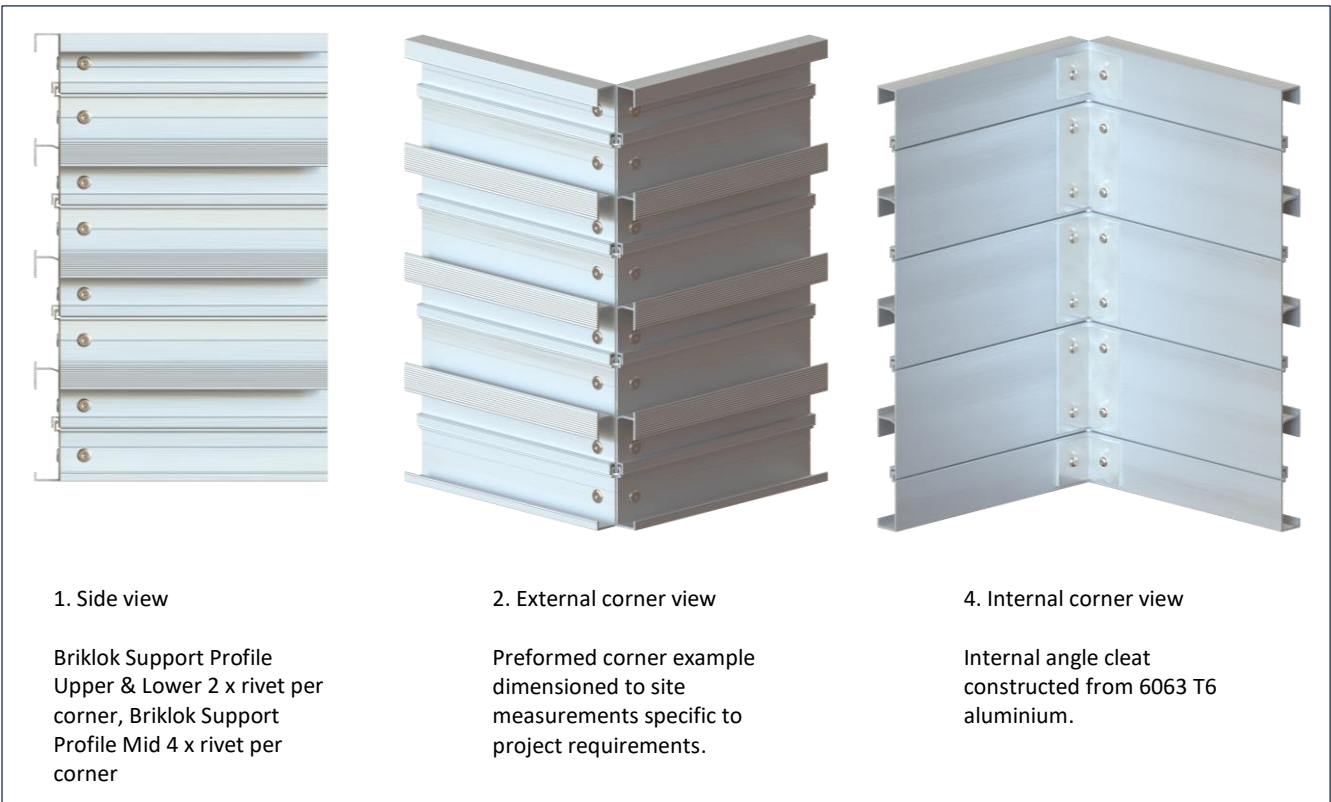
Briklok Support Profile offsite pre-formed corner detailing
